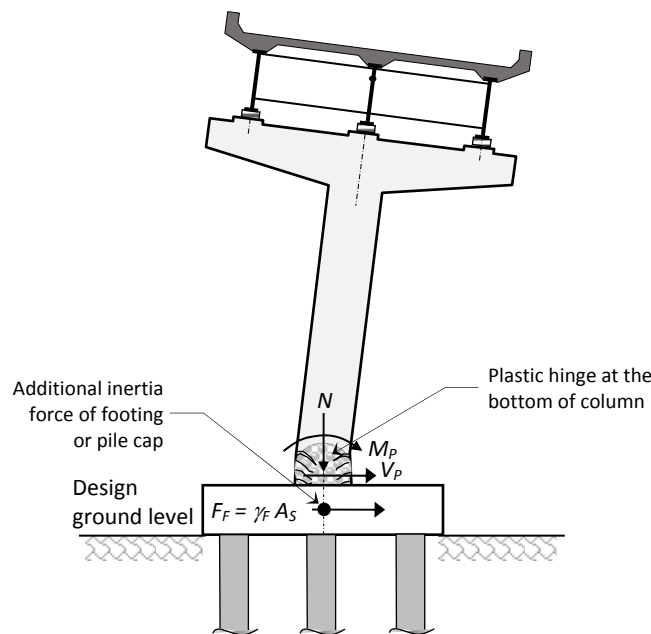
Additional Inertial Forces at Footing/Pile Cap when Applying Plastic Hinging Forces
